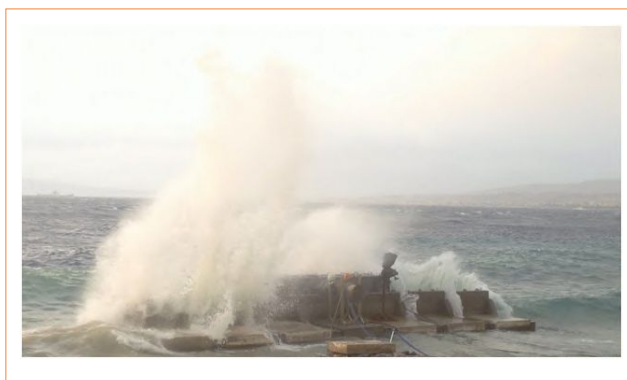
The REWEC3 plant installed in the breakwater in reinforce concrete at NOEL laboratory
